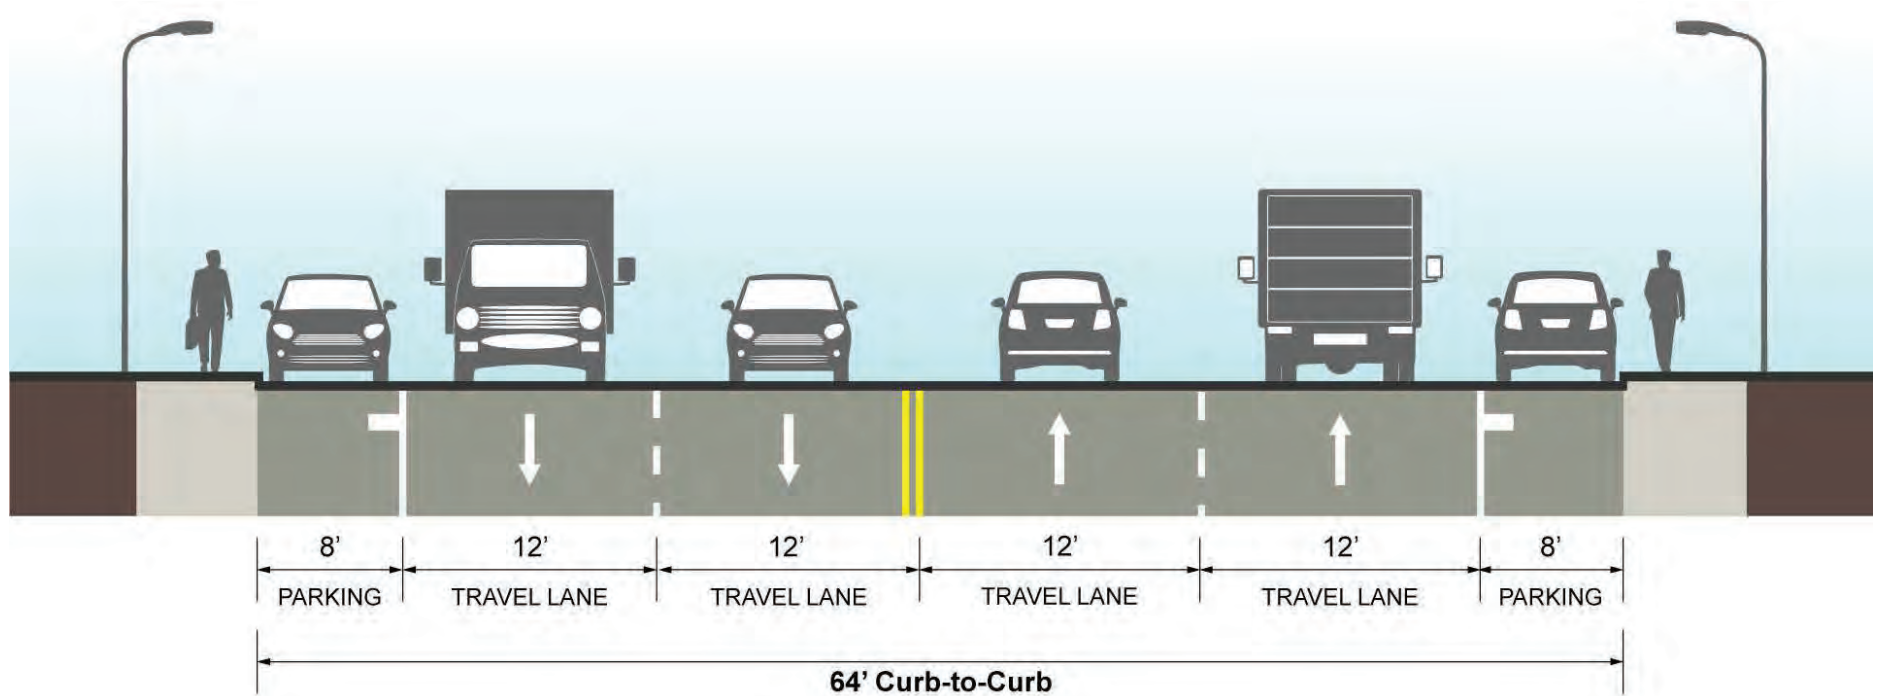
Existing Conditions/No Build Section 5 - Martin Avenue (Lafayette Street to De La Cruz Boulevard)
